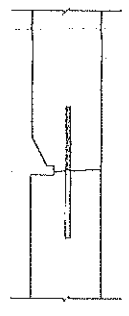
SECTION OF SHALLOW JOINT SPALLING
